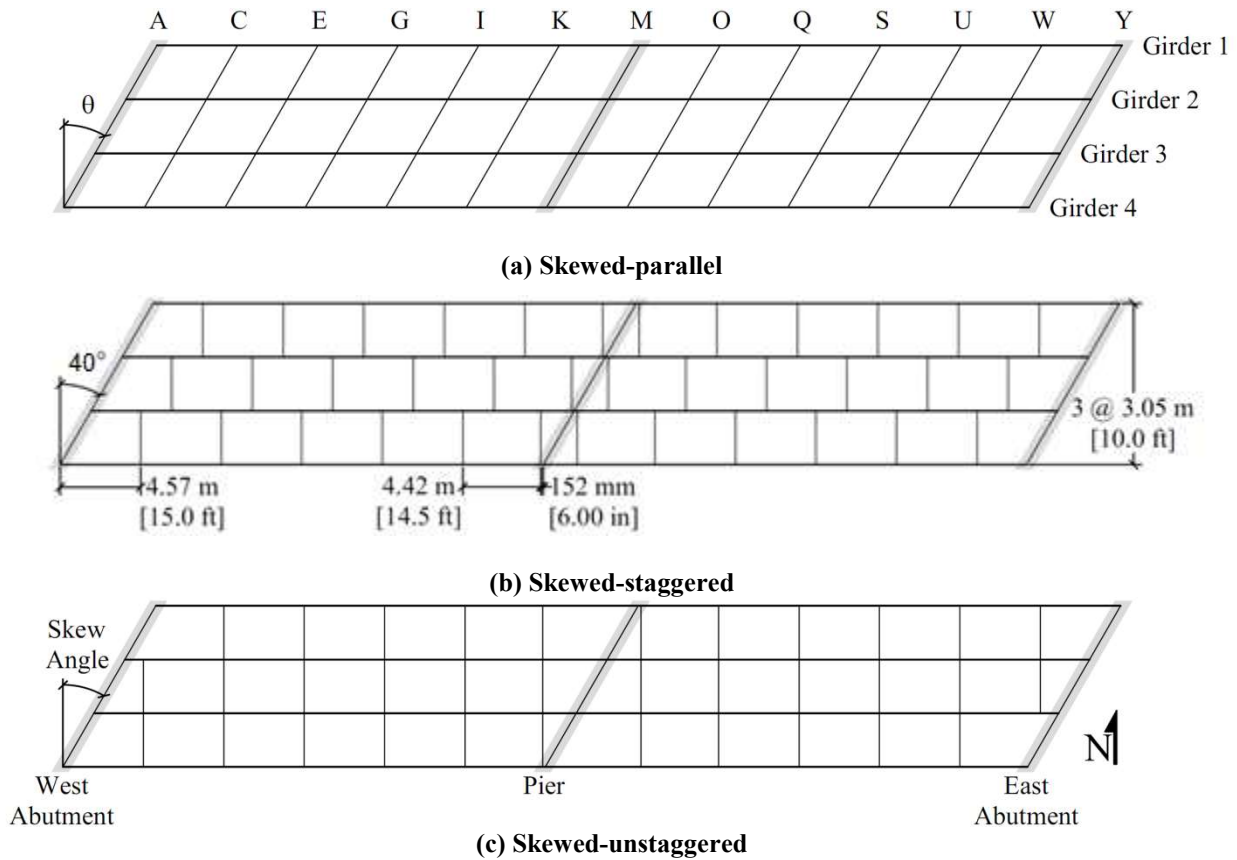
Bridge configurations (40° degree skew with 4.57 m [15.0 ft] cross-frame spacing)
